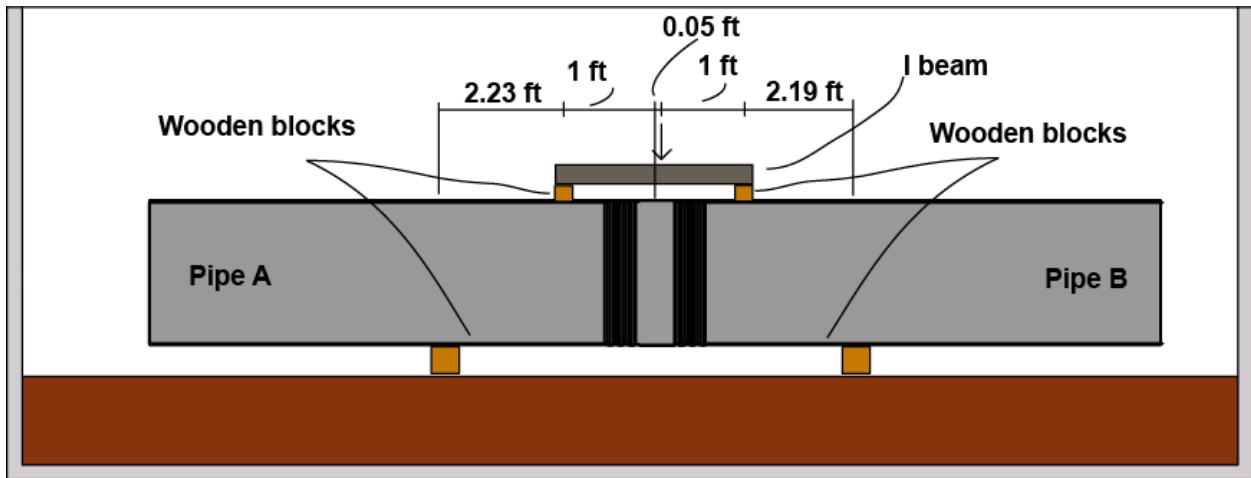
Bending test configuration of the 36 in. (915mm) corrugated steel pipe with O-rings.
